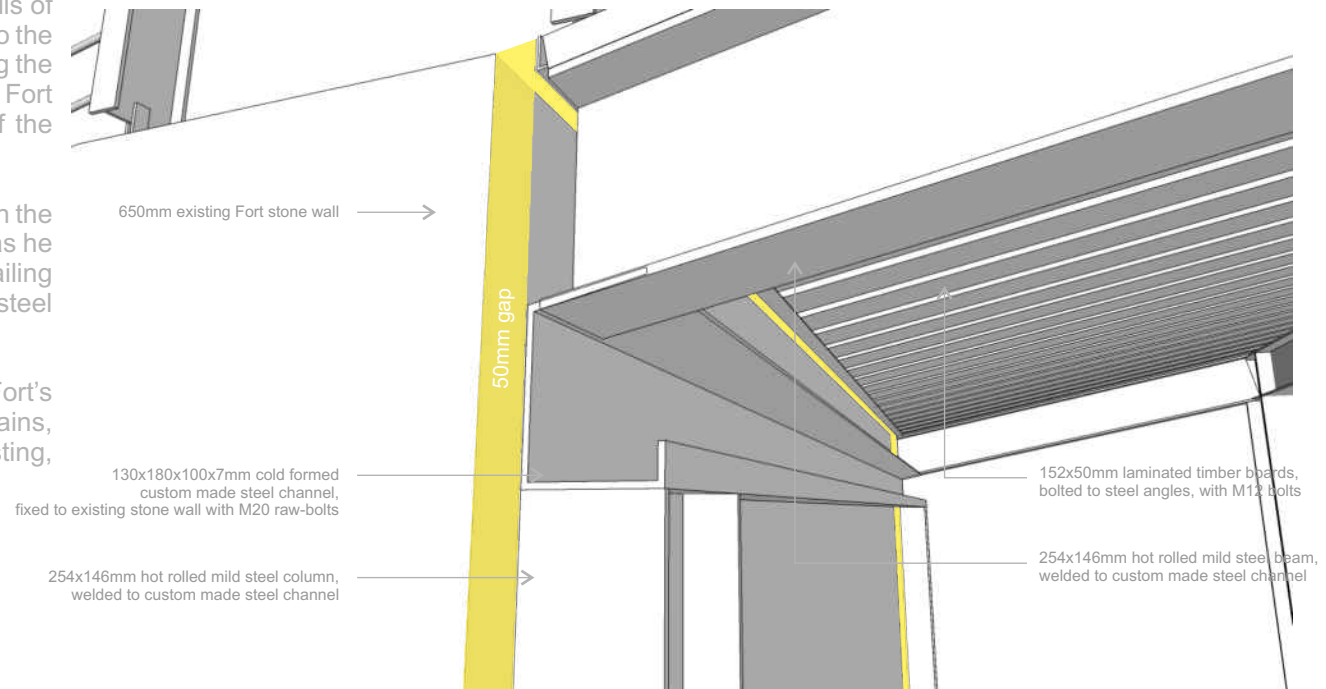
Connection detail where new meets existing (Fort). (2010)
